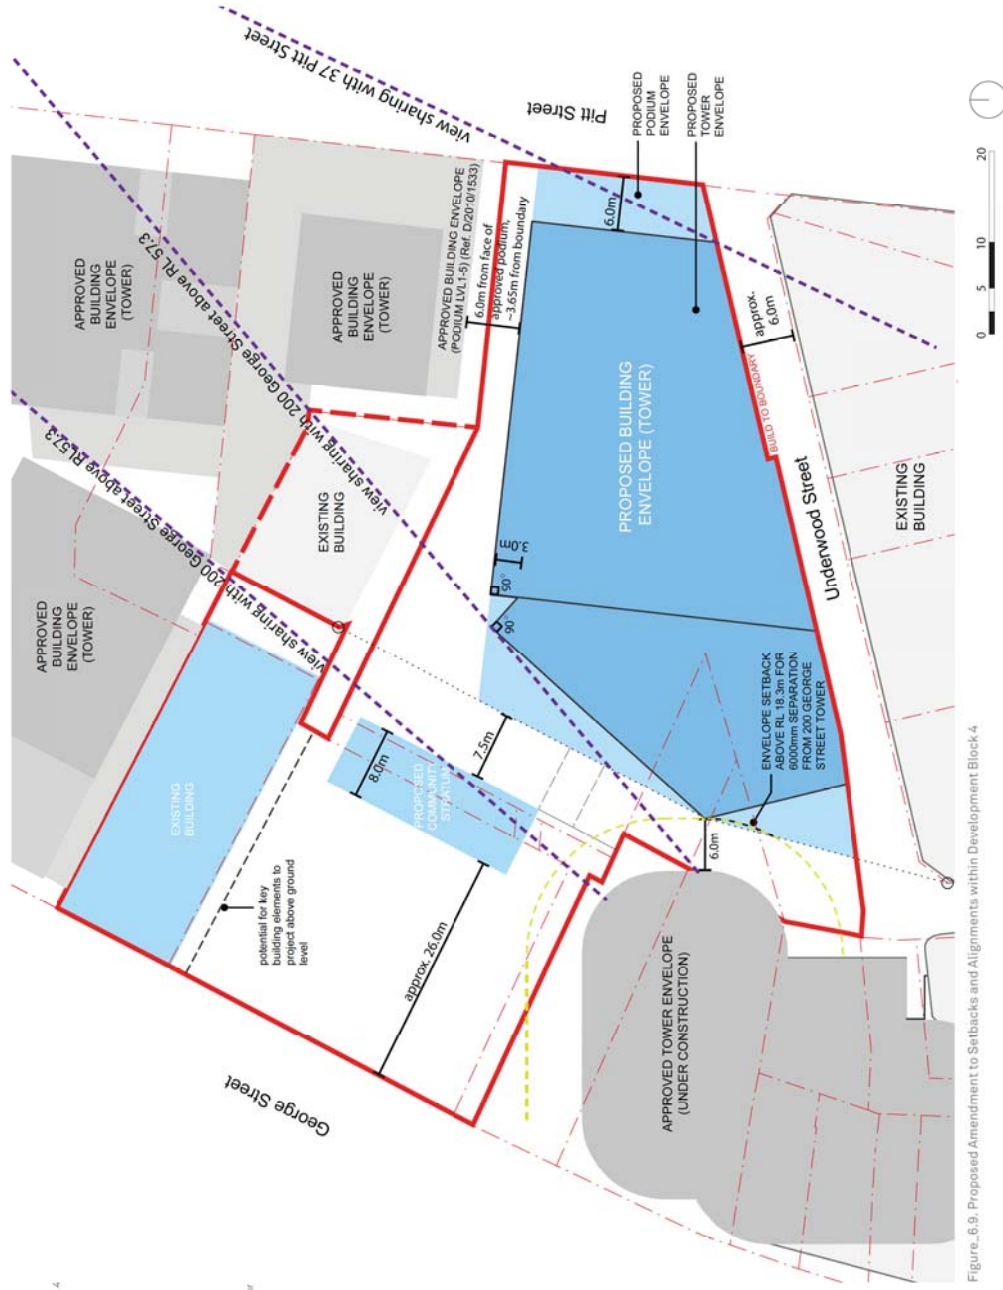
Proposed Amendment to Setbacks and Alignments within Development Block 4
